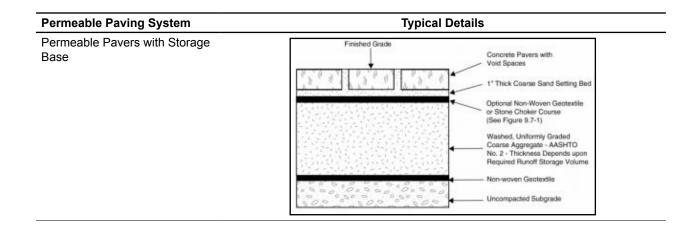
Illustrations of Cross-Sectional View of Structural Components of Permeable Pavers
